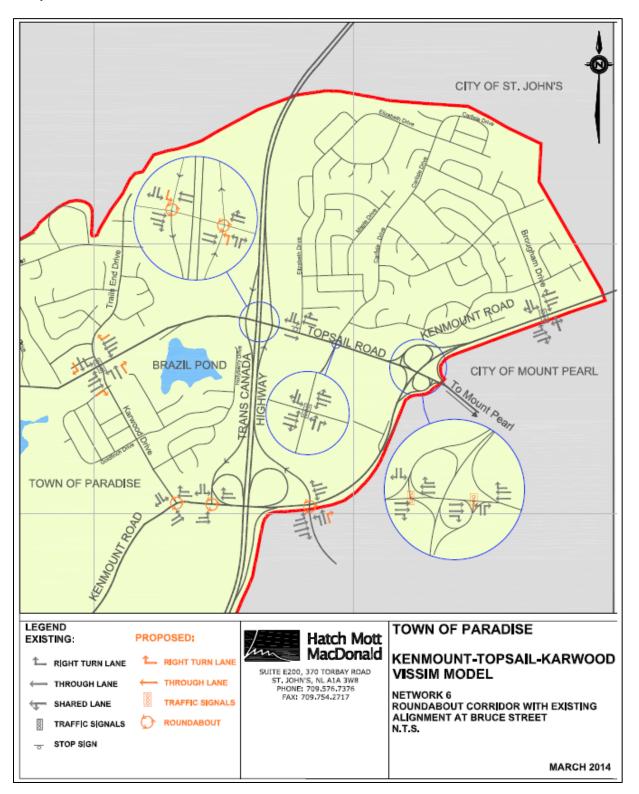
2025 Roundabout Corridor without new Bruce Street Alignment – Lane Configuration
